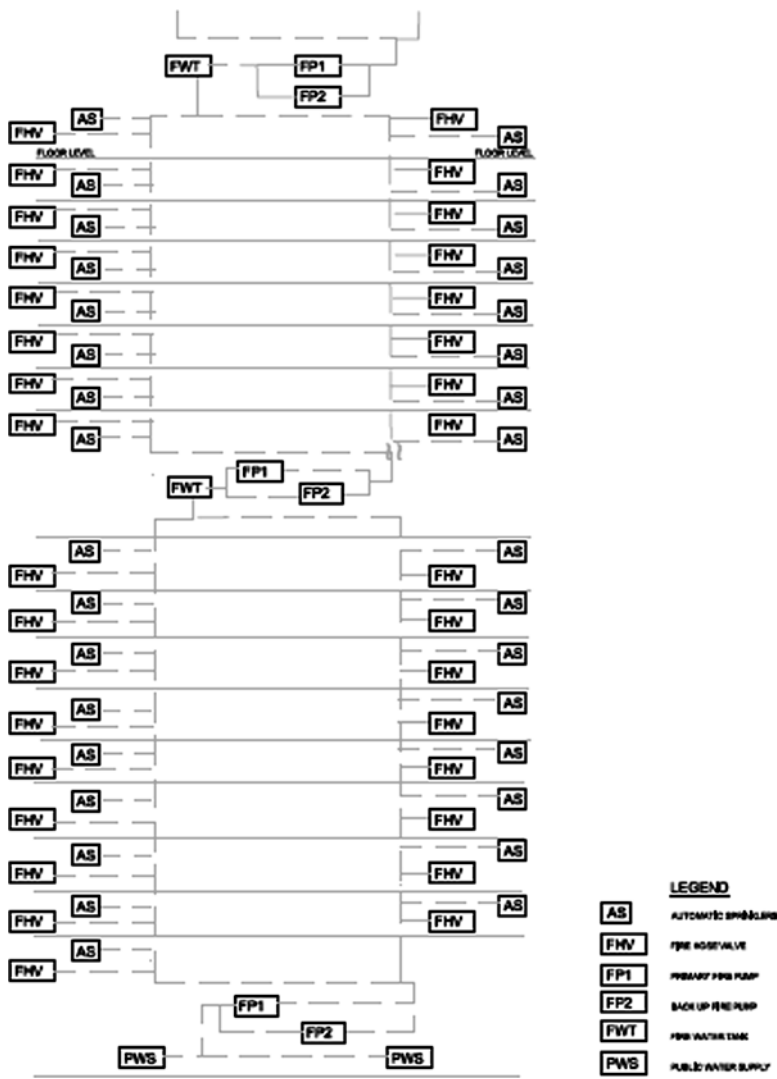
Example of a Gravity-based water storage system for sprinklers
